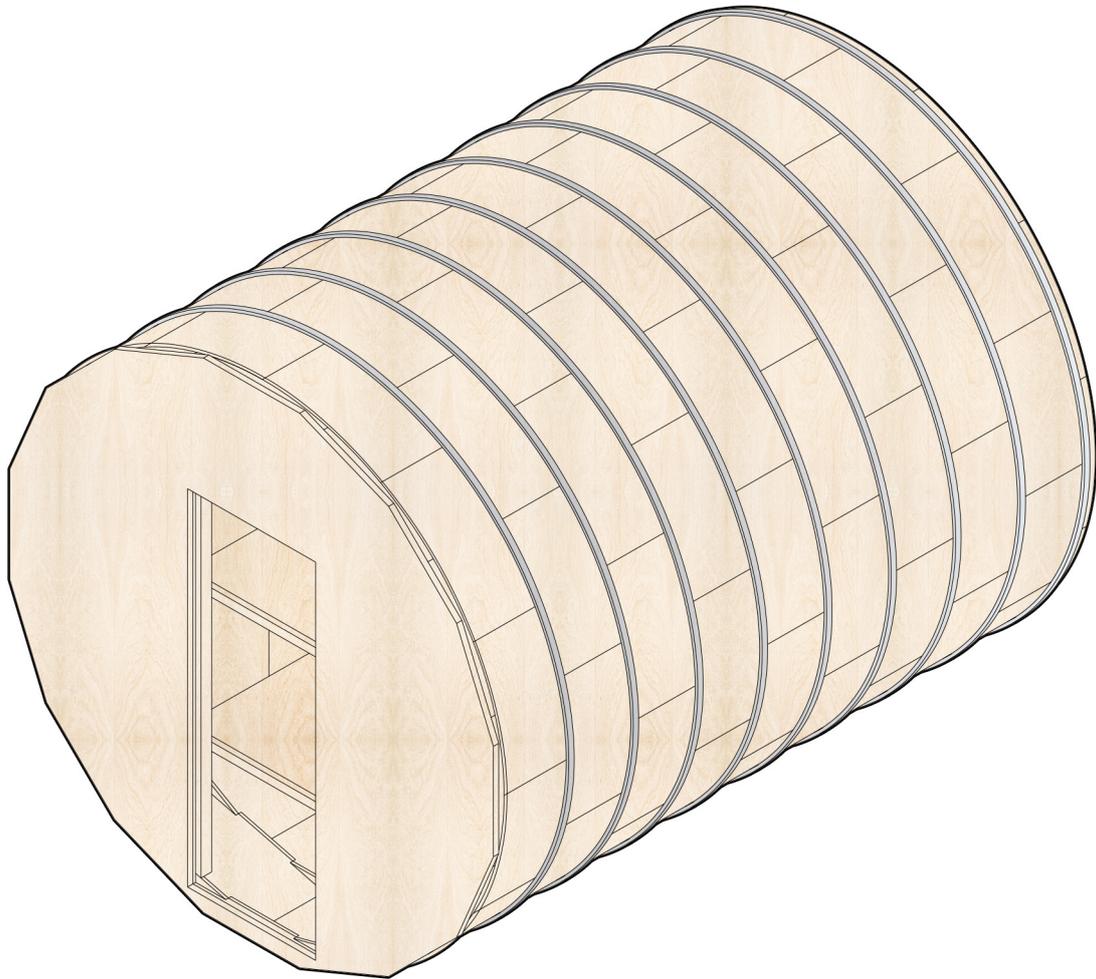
Construction stage 4 cover the ends of the tubes with timber frame and seal the gap of prefabricated panels. Original author
